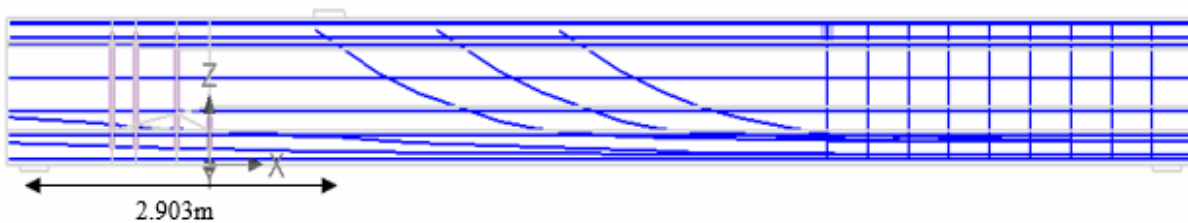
T beam without stirrups and inclined prestressing cables.
